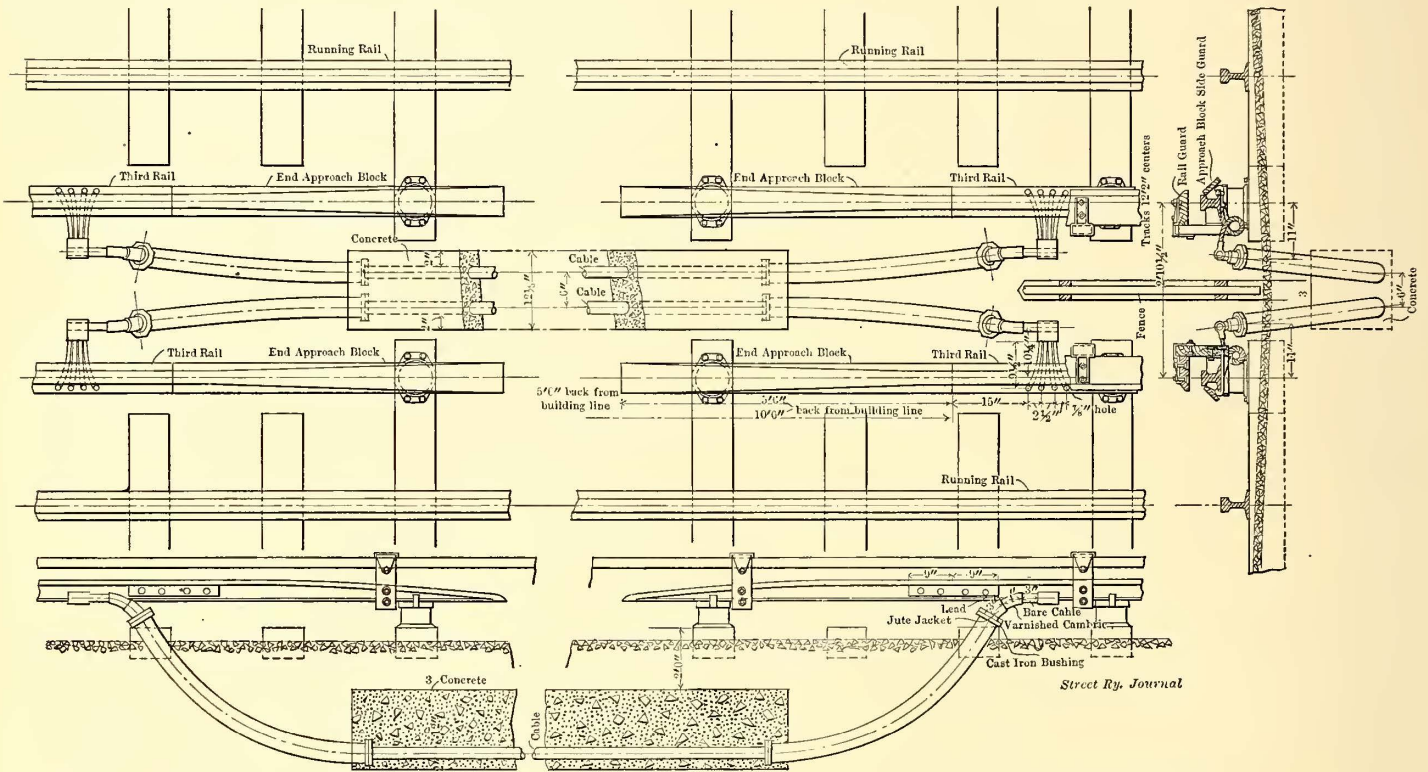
STANDARD ARRANGEMENT OF THIRD-RAIL CONNECTING CABLES AT PUBLIC CROSSINGS
